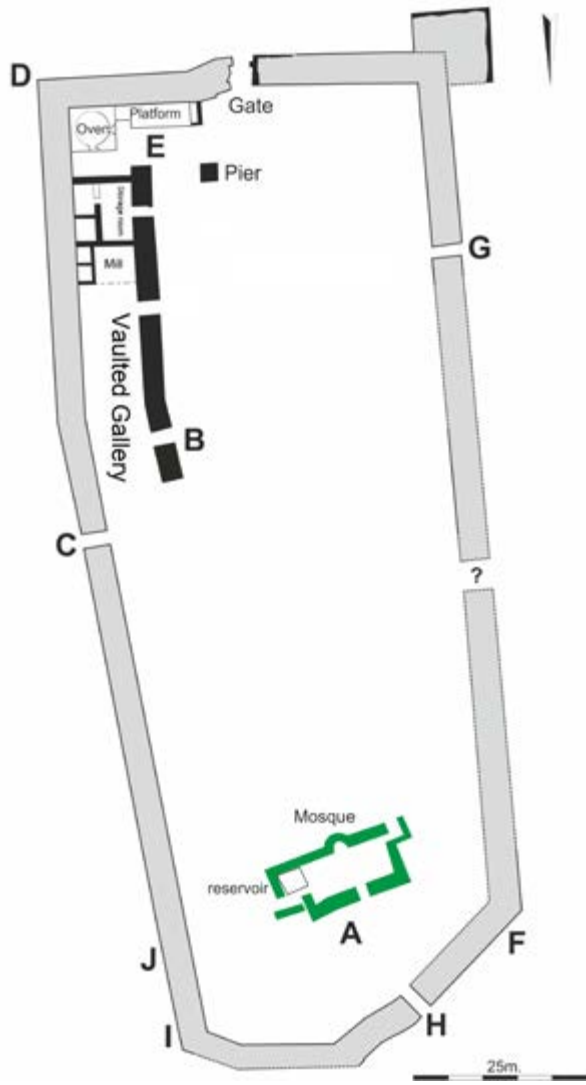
Plan of the Templar fortress with the excavation areas marked in capital letters (plan renewed by Jay Rosenberg).
